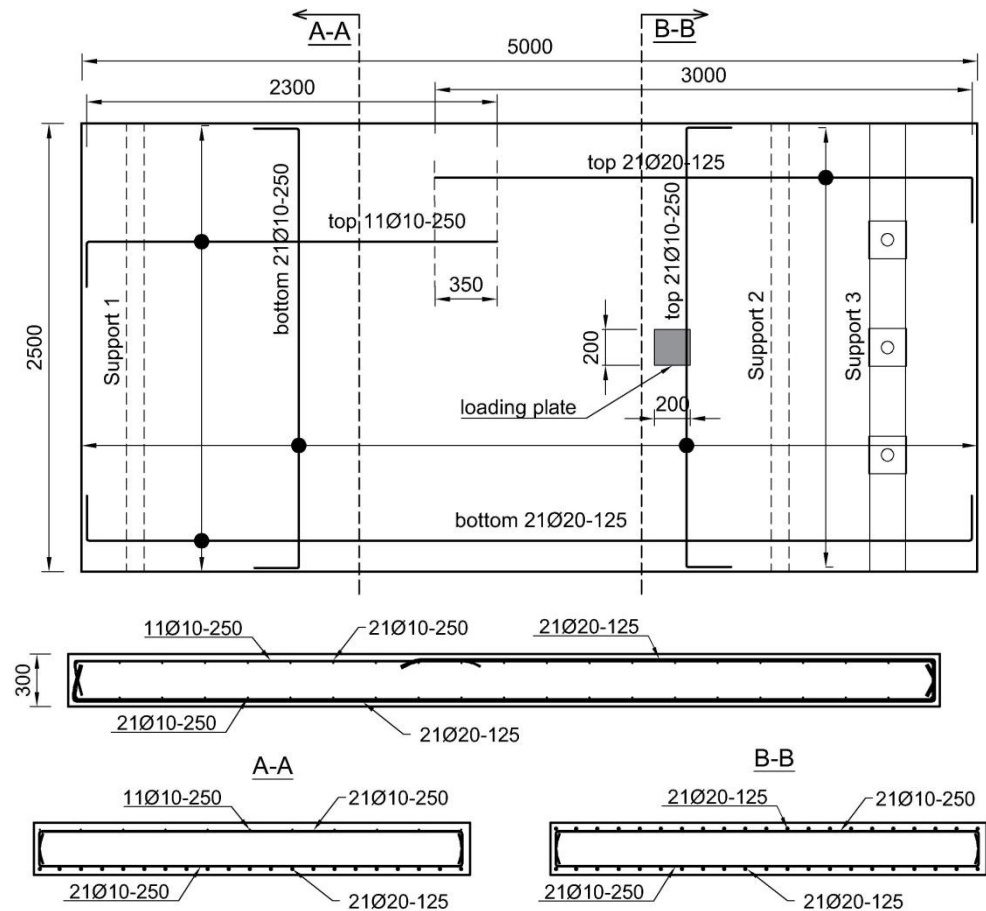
Case RS4. (a) Geometrical and (b) reinforcement details (in mm)
